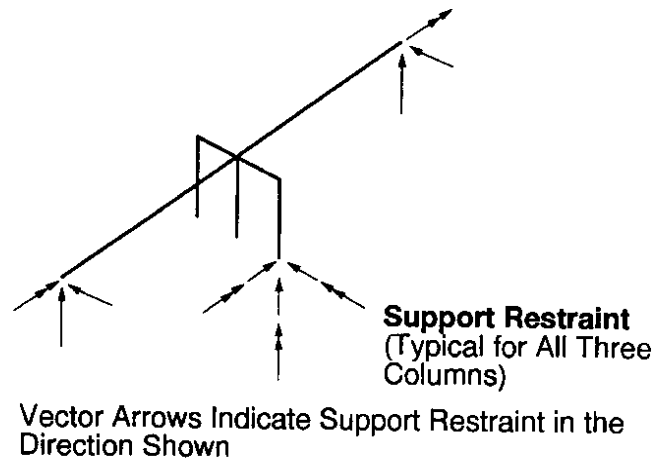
Stub Wall Abutment Details for Spring Support Model (from Mast et al. 1996a).
